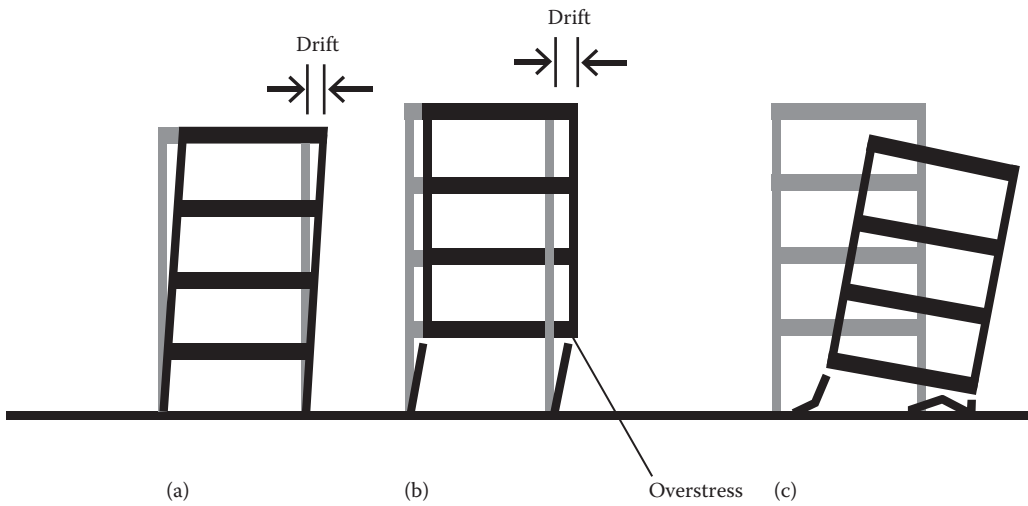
Soft first-story failure mechanism: (a) normal, (b) soft story, and (c) collapse.
